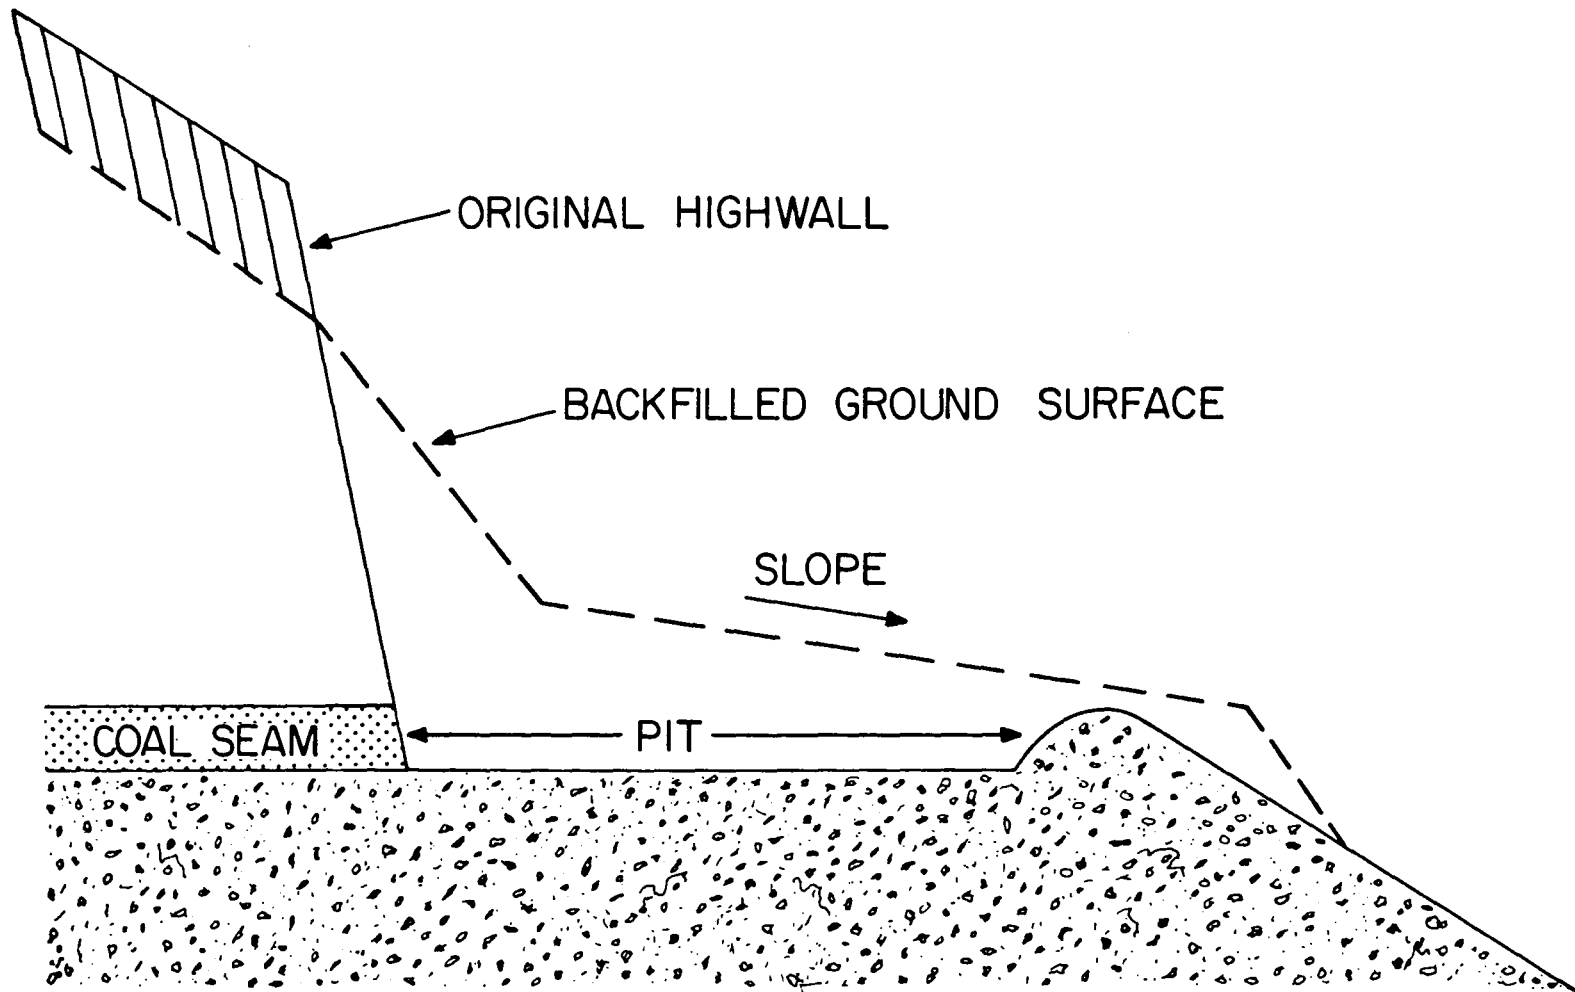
Crosssectional diagram of a backfilled ground surface, with a low, away from highwall slope.
